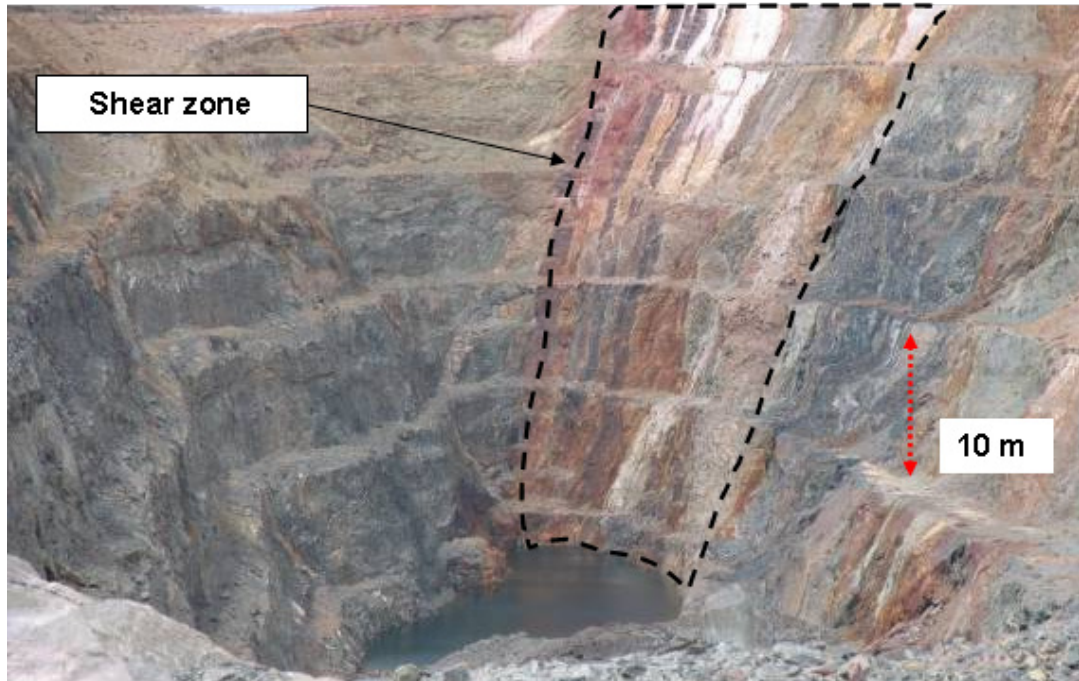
The wall of an abandoned mine with a shear zone through the south wall. Each tier or “bench” is approximately 10 metres in height.
